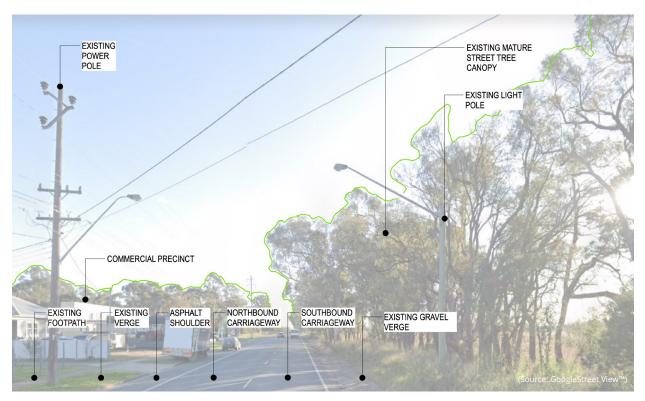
Viewpoint 10 - Intersection of Namatjira Avenue and Londonderry Road (facing north) - Existing view
